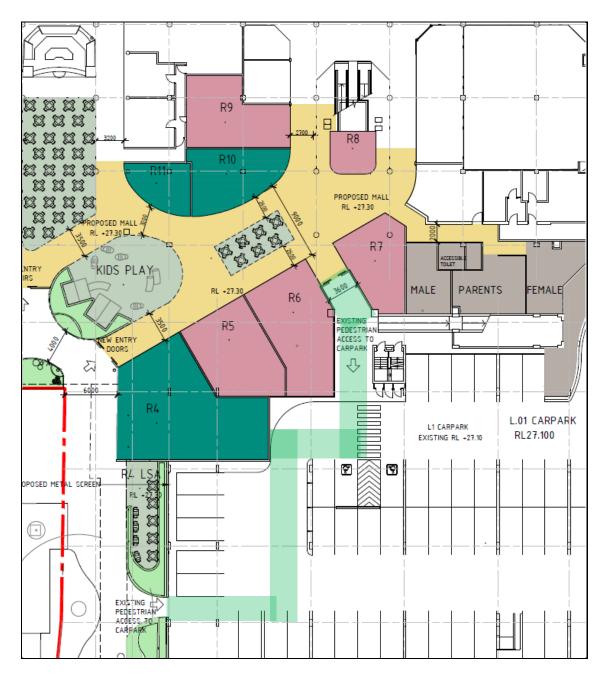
Path of travel from the proposed shopping centre exit via the carpark to reach 'open space'
